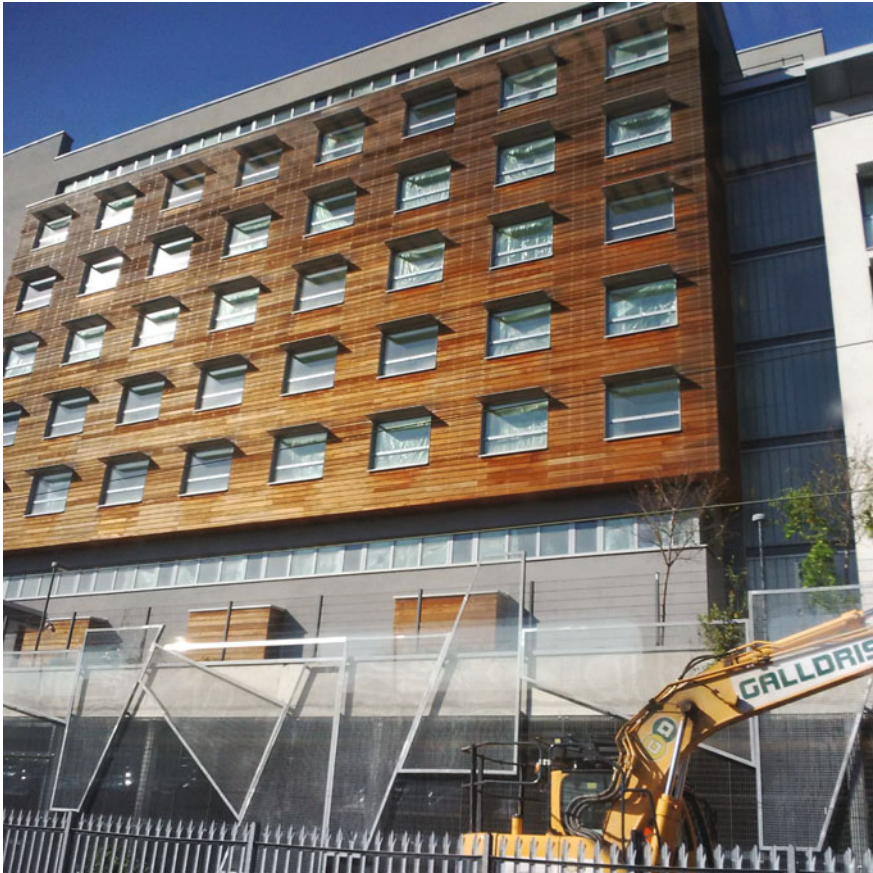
Other buildings may use timber as a cladding rather than a structural component
